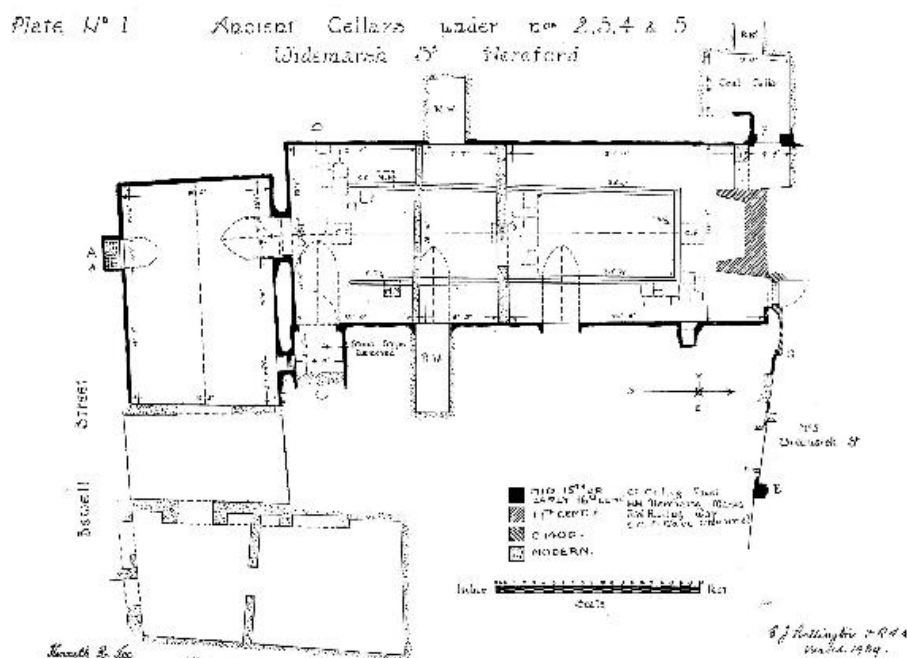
Edward Bettington's 1939 plan of 15th-century undercrofts set back behind the frontage of 2-5 Widemarsh Street
